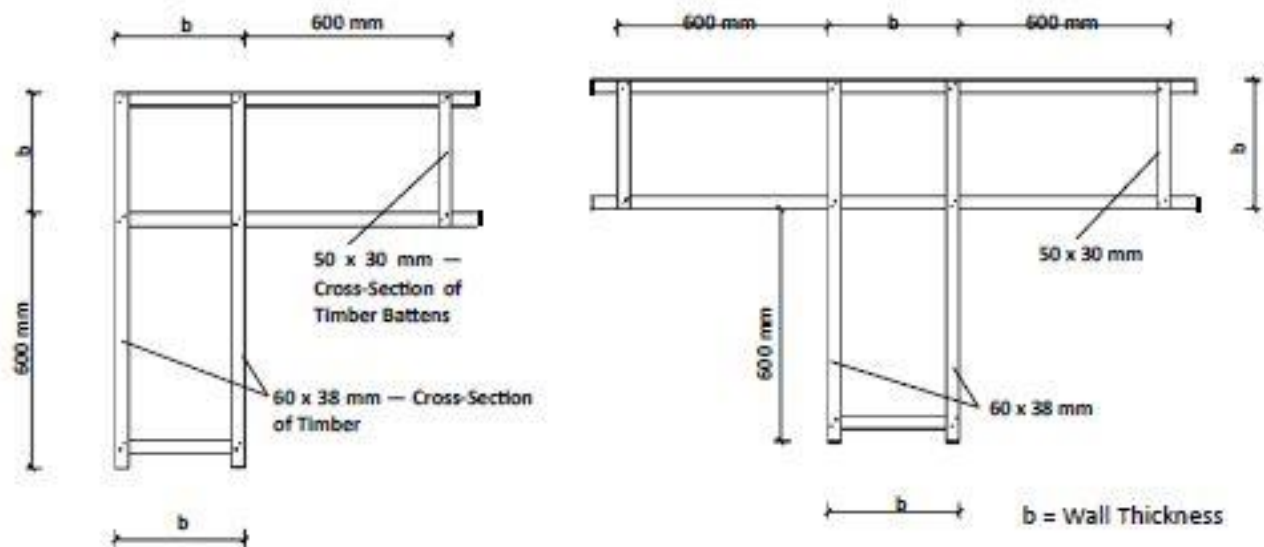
Stitches made from wood dowels at wall corners and intersections (adapted from: Bothara et al. 2002)
